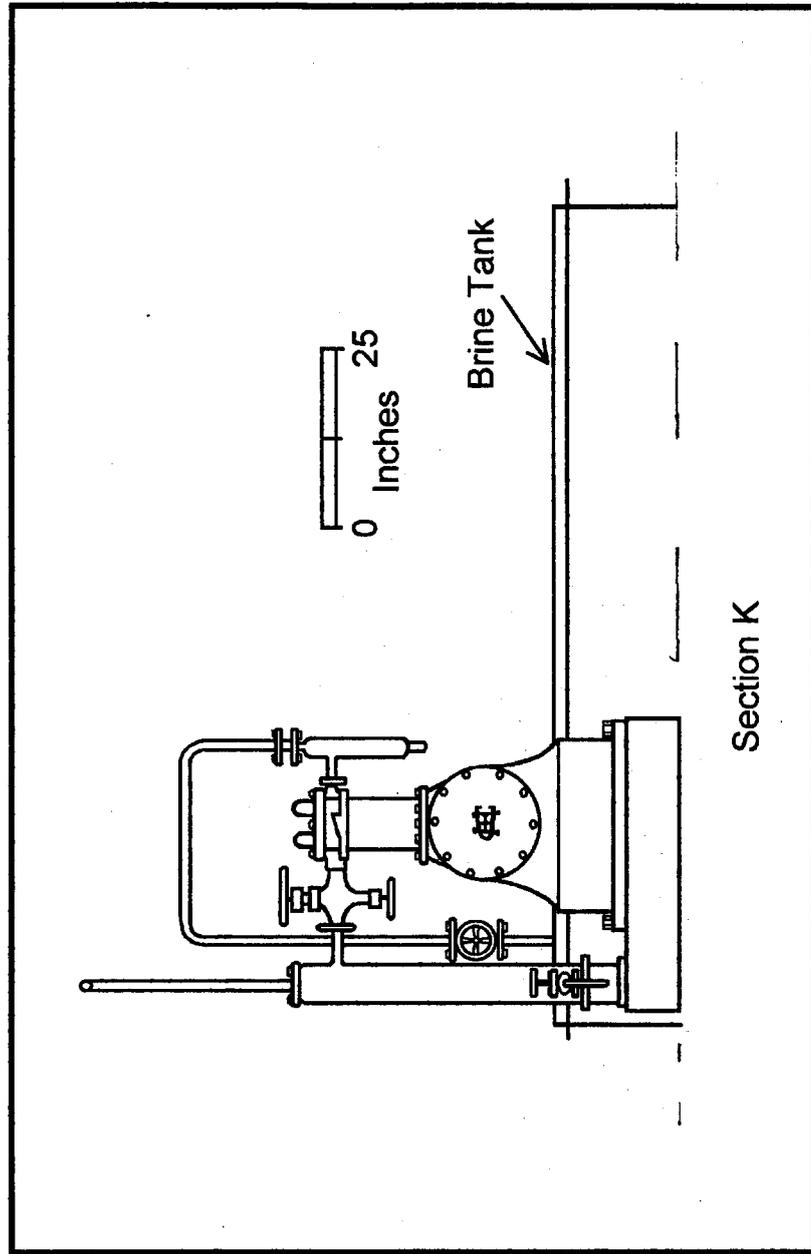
A view of the ice machine compressor at Section K of Figure 29.
